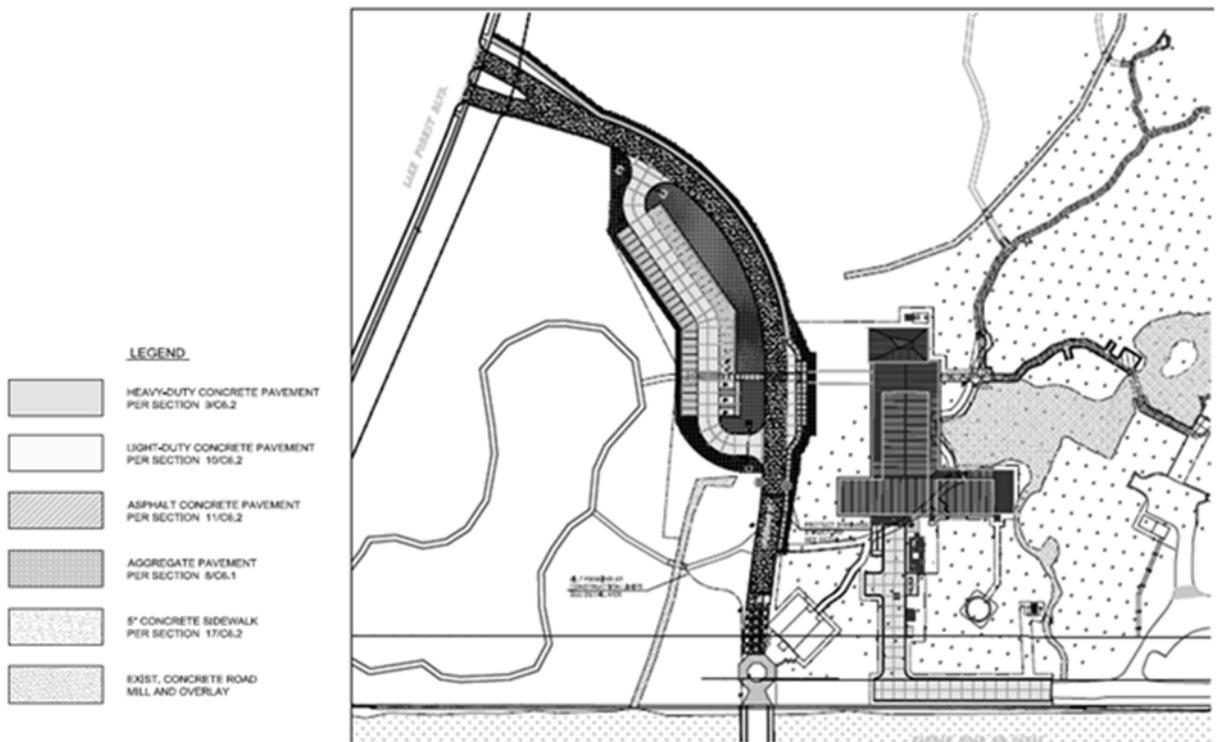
Site of ANC, showing the proposed/preferred building and parking locations and layout detail
